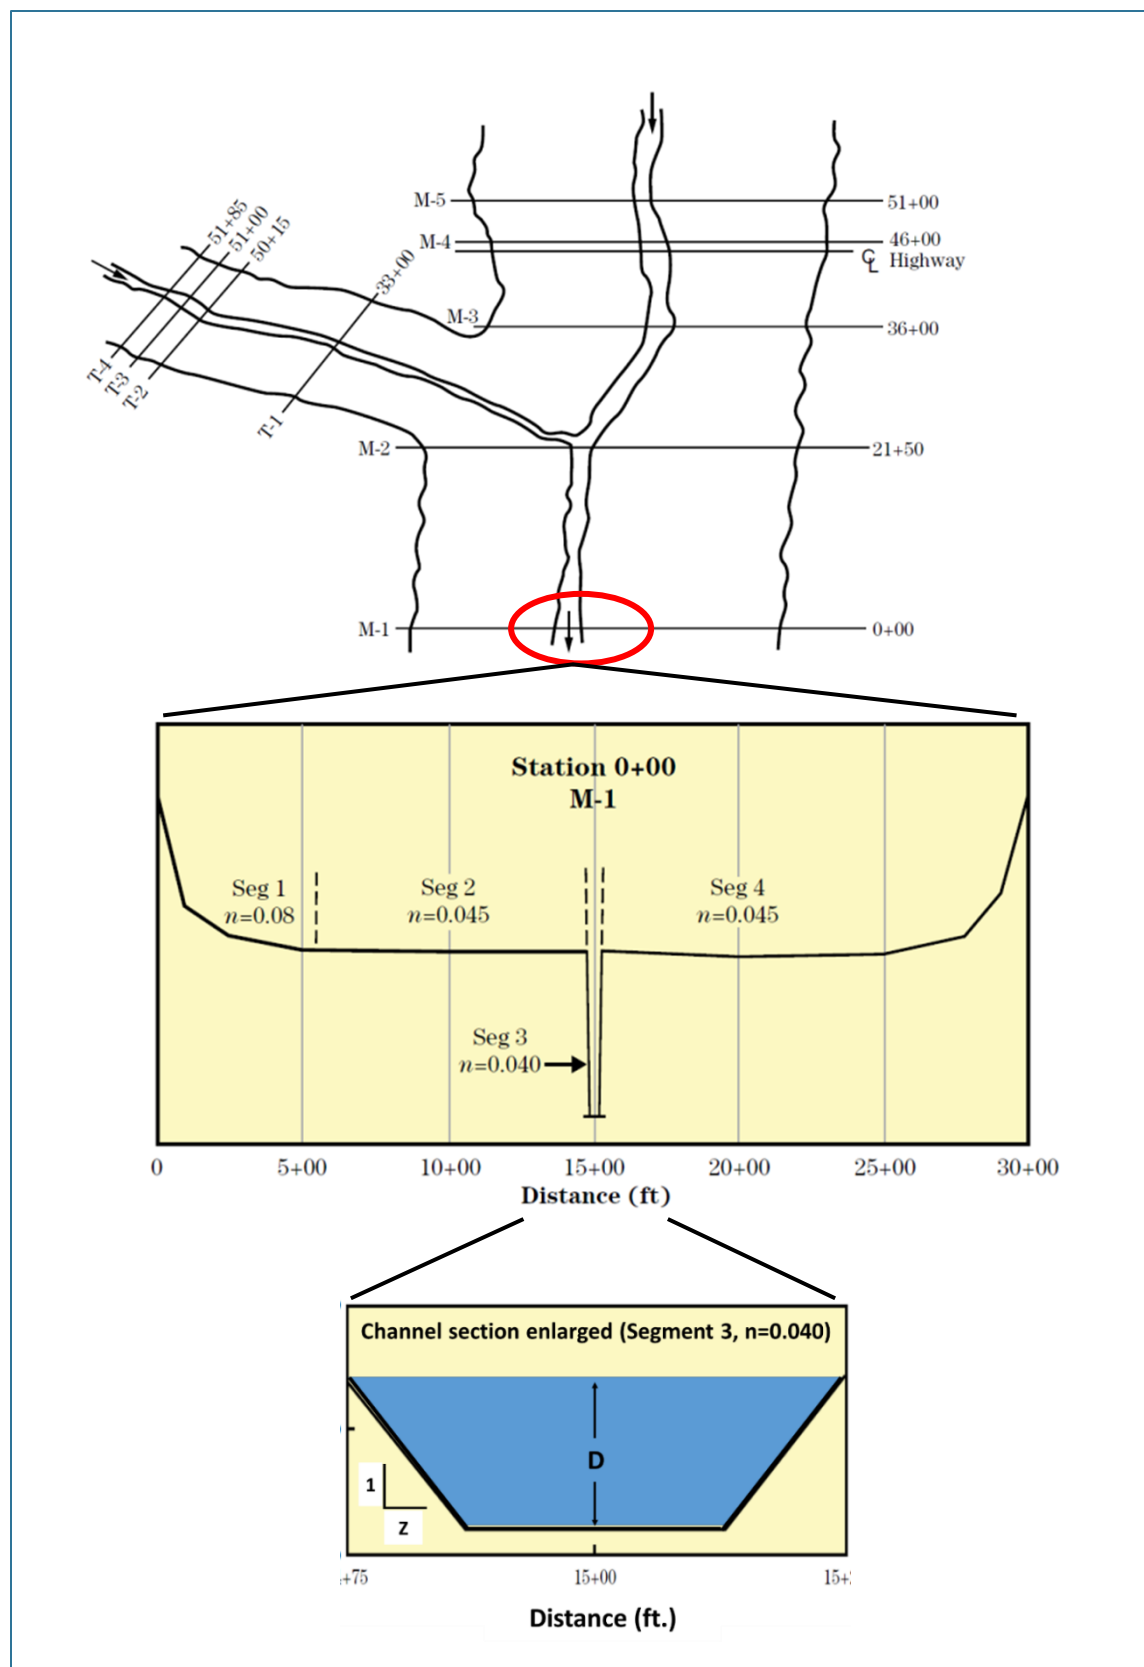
Example Downstream Channel Profile and Cross-Sections
